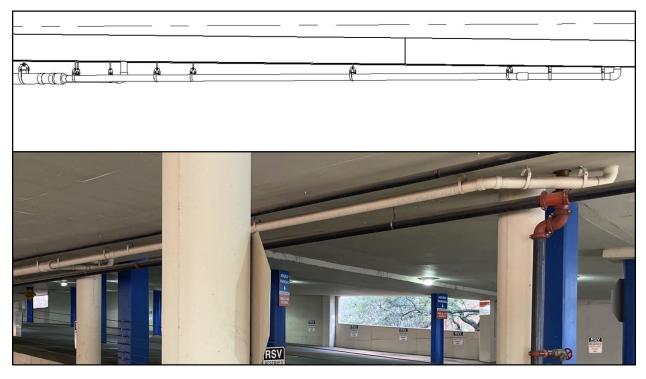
Final two downspouts on opposite ends and pipe reducer on the far left
